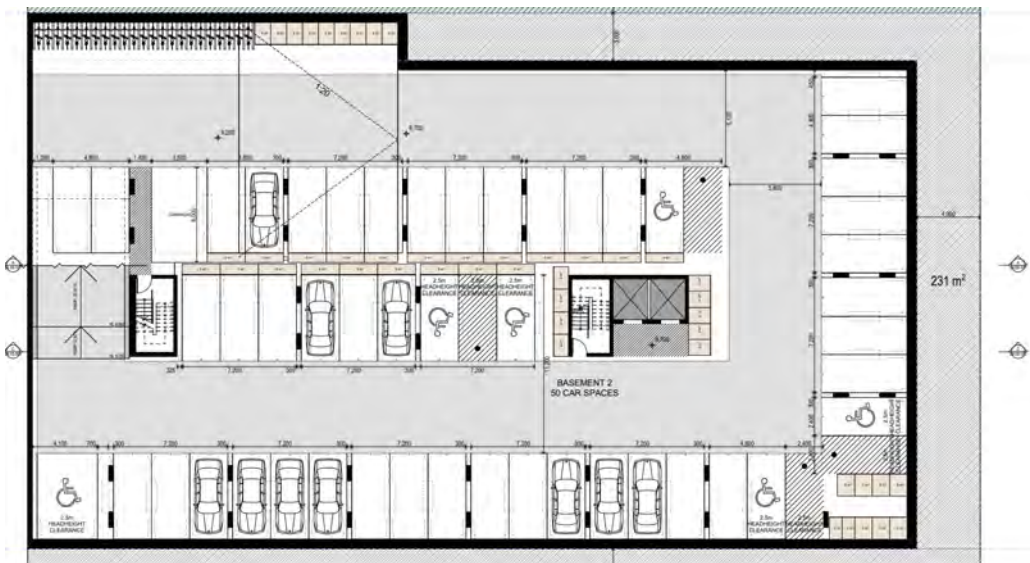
Approved DA2016/170/2 basement 02 plan showing 50 car parking spaces.
